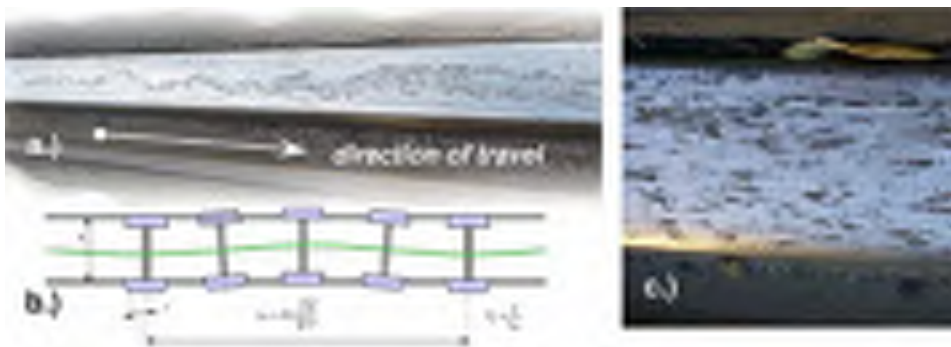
a) Corrugated shape of failure; c) Longitudinal fatigue defects on the whole cross-section of running surface
